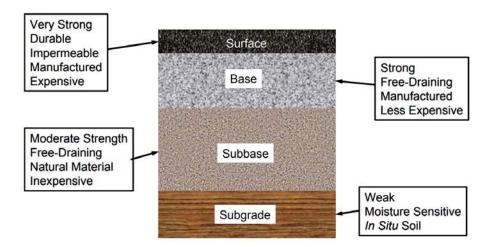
Typical design of a road and substructure as per FHWA-NHI-05-037
